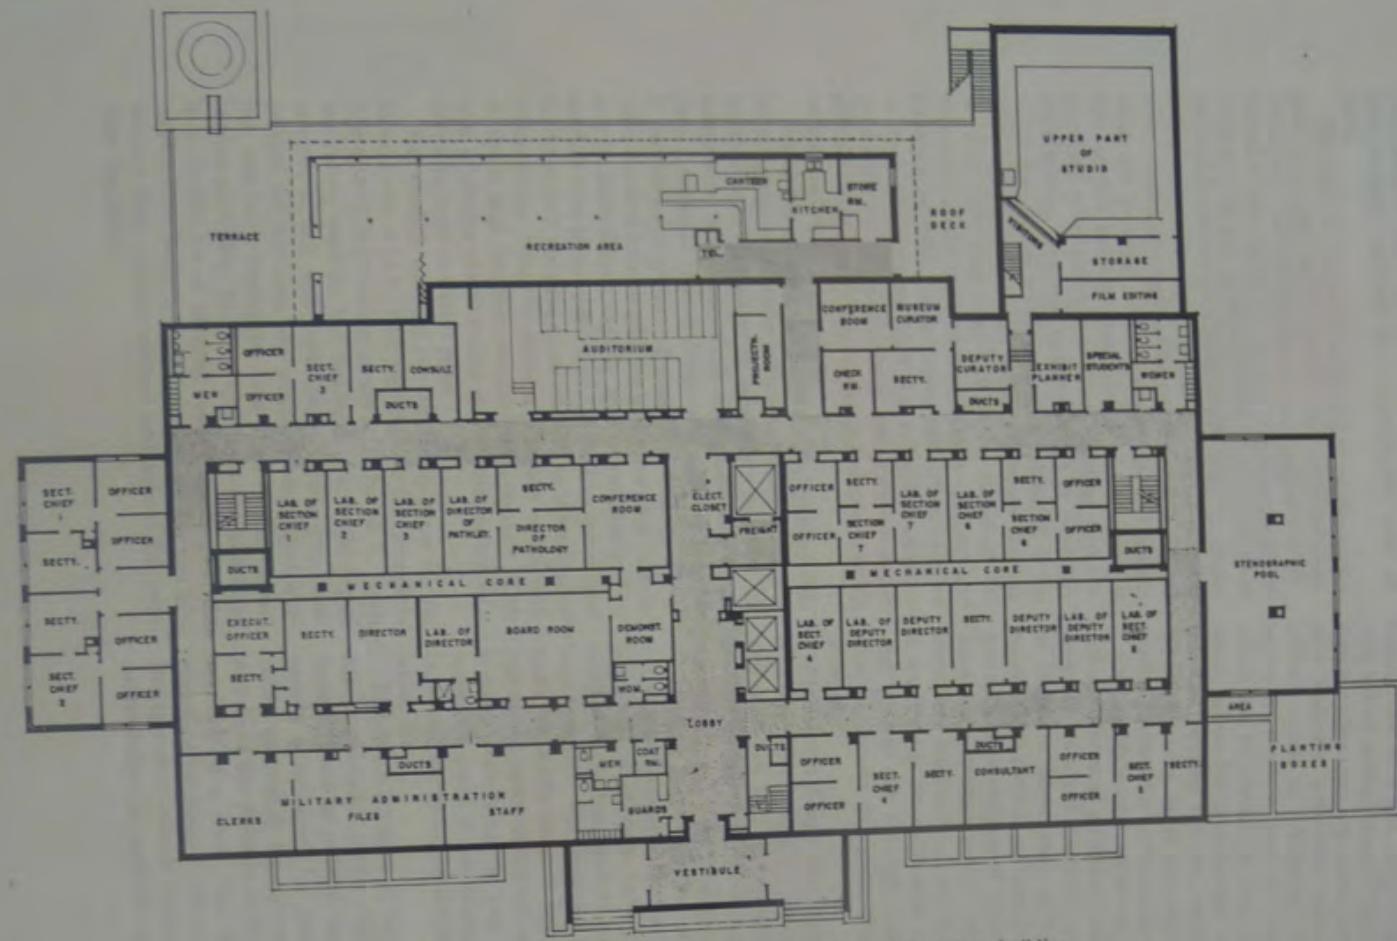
First-floor plan of the Armed Forces Institute of Pathology building.
